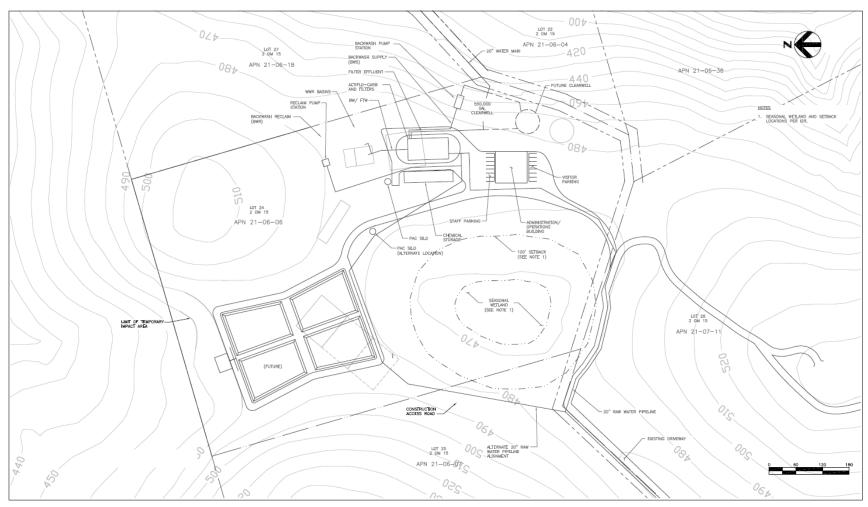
Proposed Water Treatment Plant Layout (San Benito County Water District 2014)
